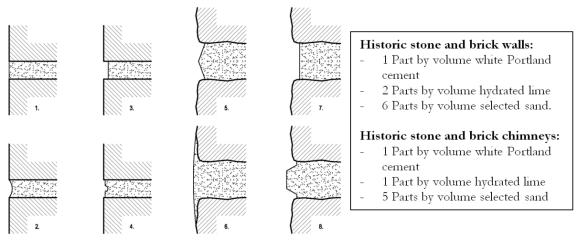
New mortar joint profiles should match the pattern of original pointing. Brick joint profiles shown are [1] Flush, [2] Concave, [3] Slightly recessed – struck flat, and [4] Scribed. Stone joint profiles shown are [5] Shallow raised ridge, [6] Parge pointing (appropriate only where matching existing parge pointing), [7] Recessed – struck flat, and [8] Raised ribbon.
